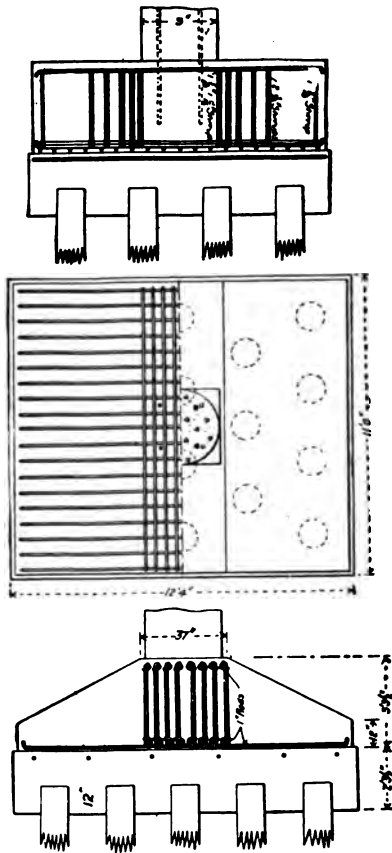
Column Footing, Bush Terminal Co. Factory.
